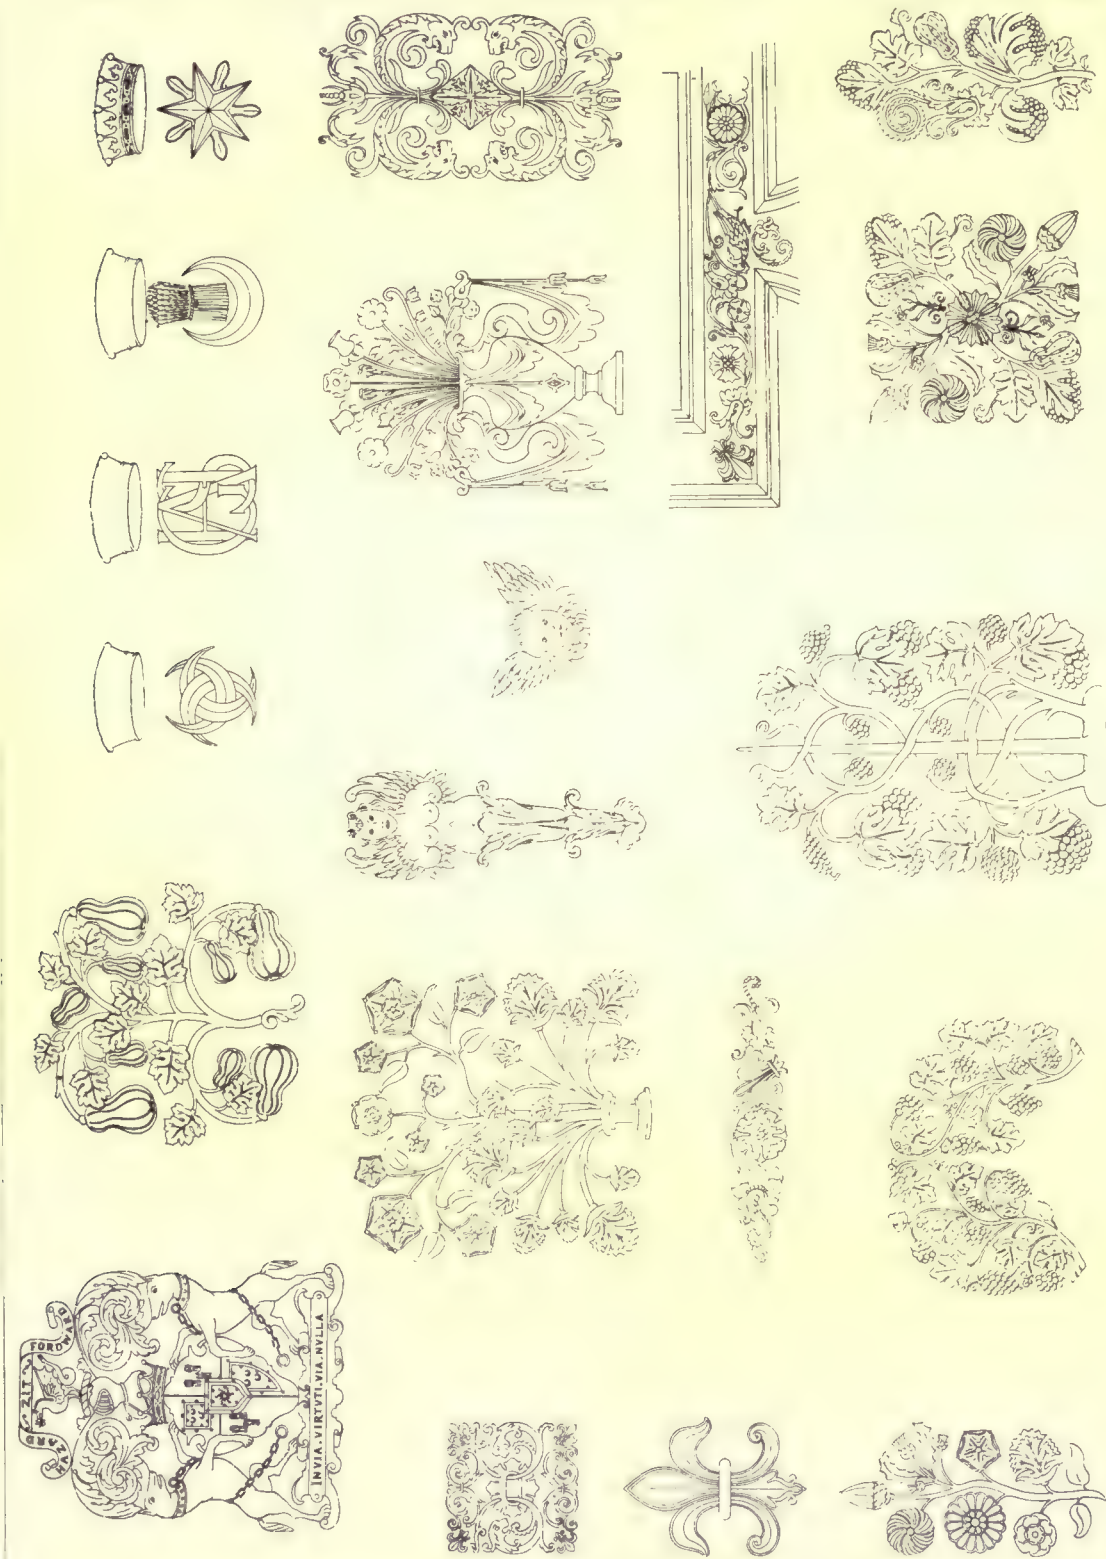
DRAWING-ROOM DETAILS, WINTOUN HOUSE.
